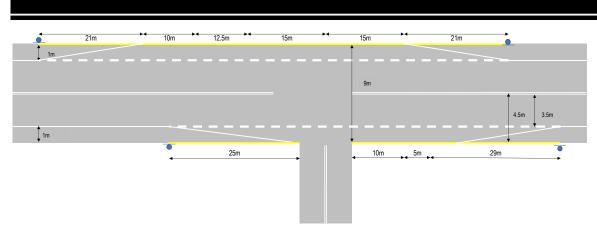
Montwood Drive Access Arrangement (recommended)
